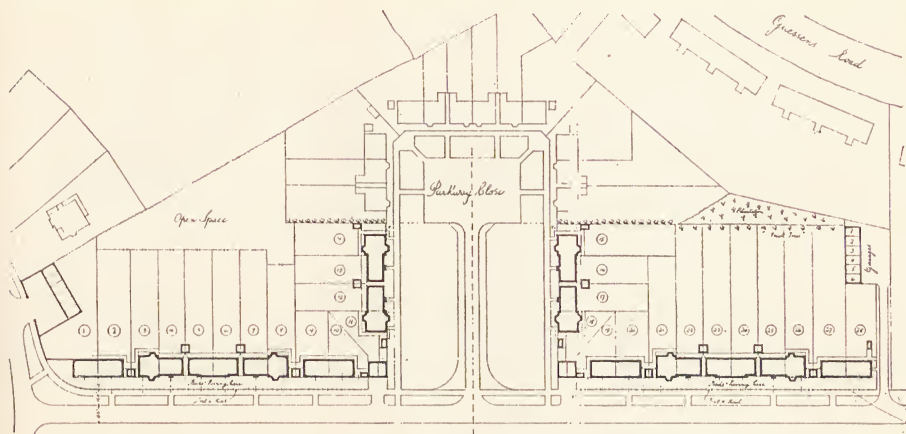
B.—GROUPED HOUSE SCHEME, PARKWAY, WELWYN GARDEN CITY
